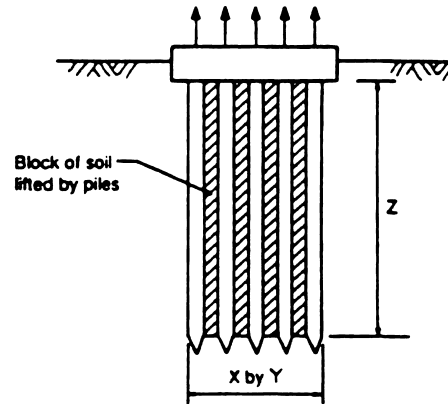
Uplift of group of piles in cohesive soils (After Tomlinson, 1987)
